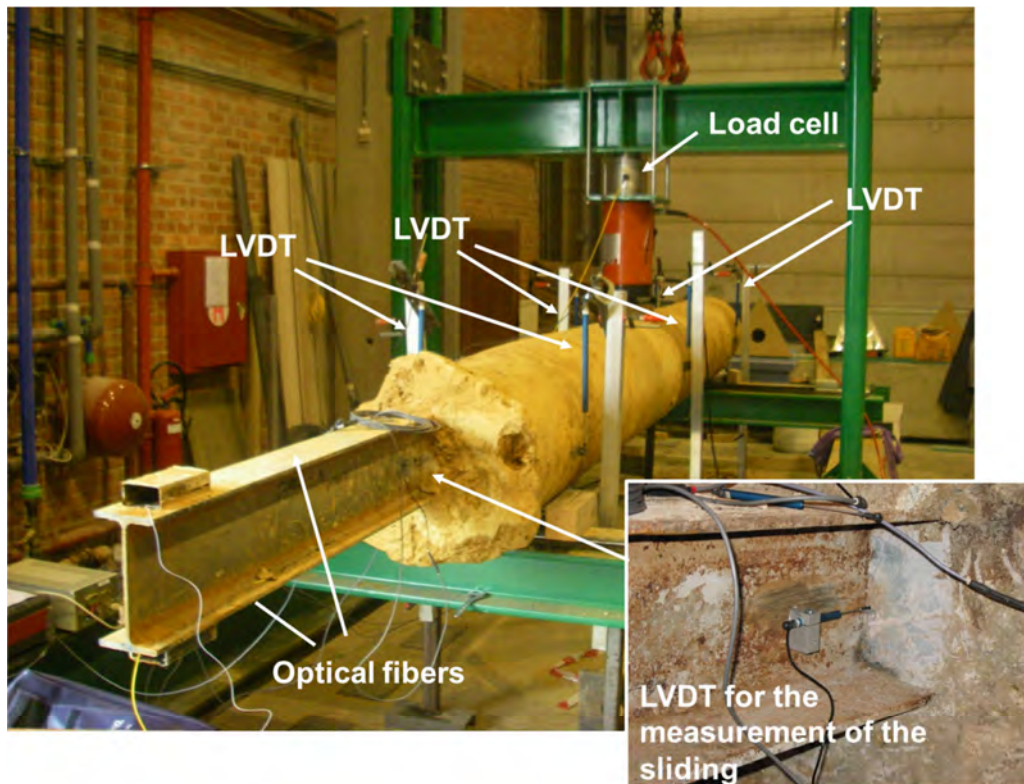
Measurement devices used for the continuous monitoring of the soil mix element during the large-scale bending test
